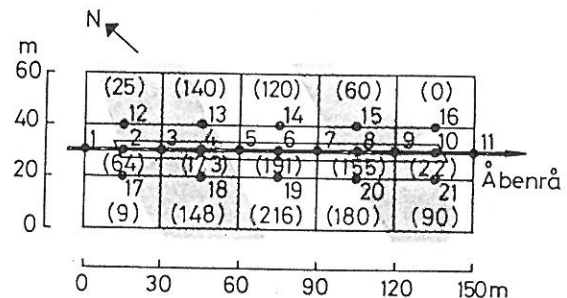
Sectional subdivision of embankment fill and culvert (numbers are points where settlement calculation is carried out and numbers in parenthesis are loads in MN for the section).
